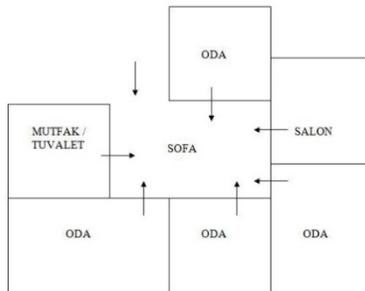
A housing plan scheme in Doğan Apartment (Mutdoğan, 2014)
